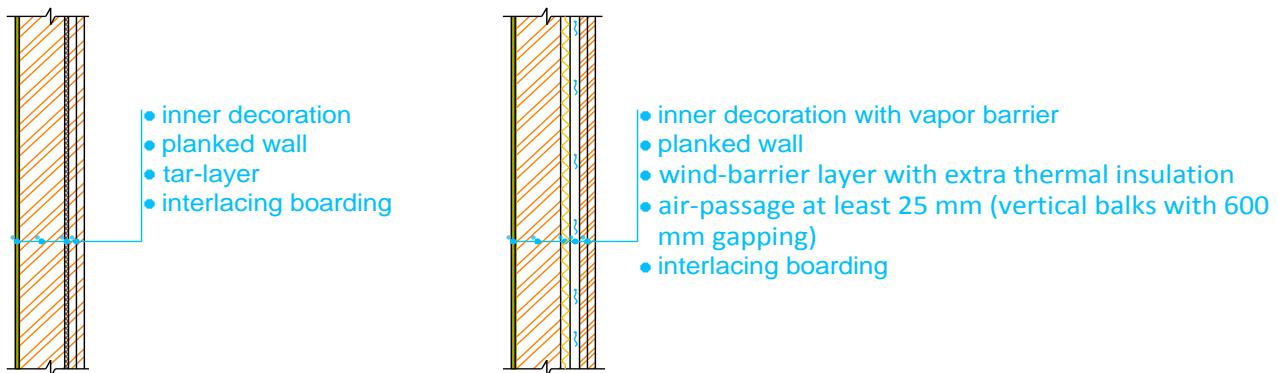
Schematic drawings of wall structure. Existing structure – on the left; prospective structure – on the right
